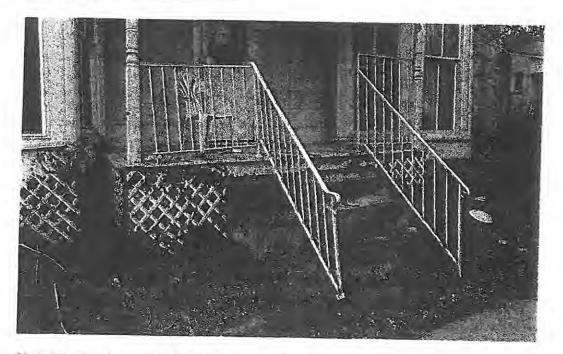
Deteriorated Porch Floor Framing and Stoop
